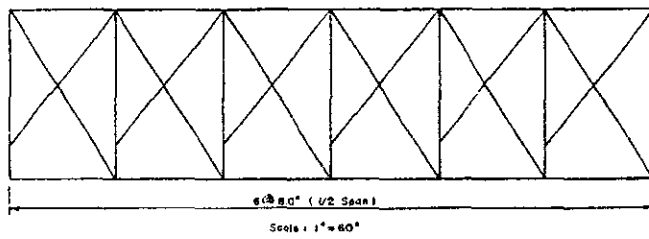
STAATS MILL - LINE DRAWING OF TRUSS SECTION
